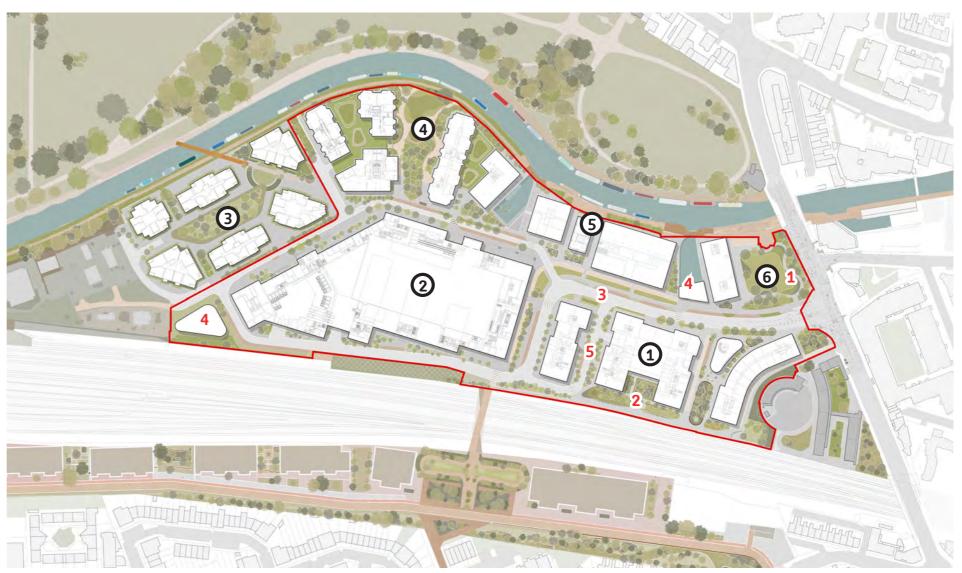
Base Masterplan - Summer 2023 - Planning Application
